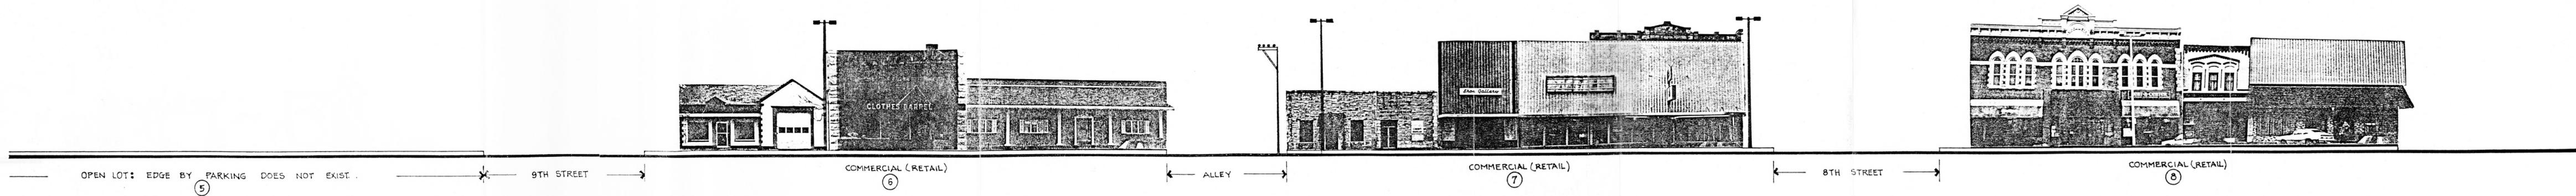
EAST ELEVATION FROM WASHINGTON STREET.
